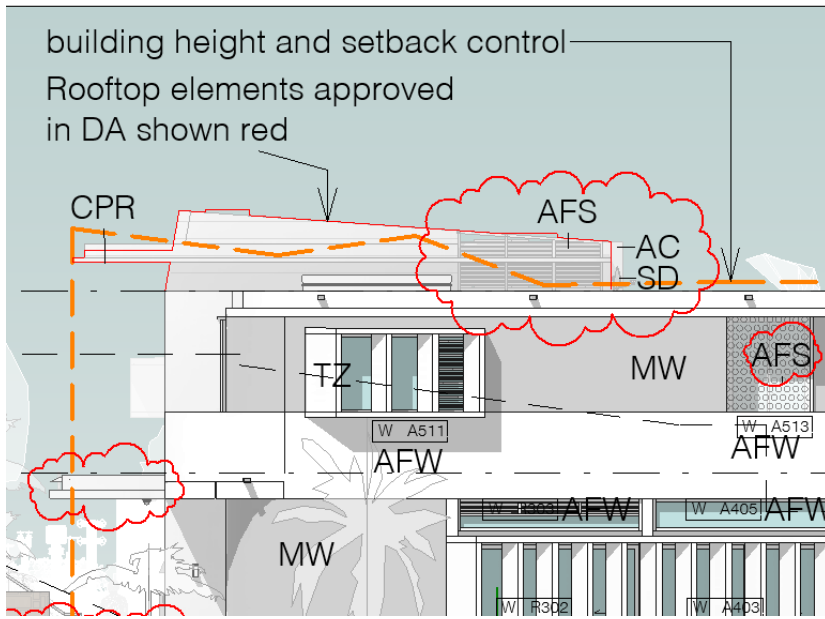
Part Elevation on DA10 showing approved DA compared to Section 4.55 application rooftop elements
